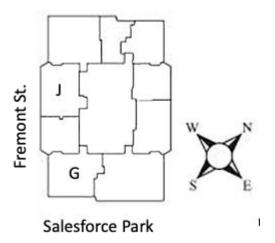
Floor plan of condo units in a residential building adjacent to Salesforce Park. G units overlook the park. J units overlook the street.
